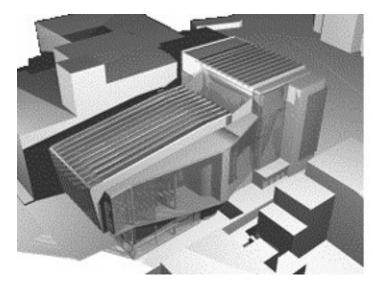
Fabric wall design Small-scale application of a multi-layered fabric exterior envelope
